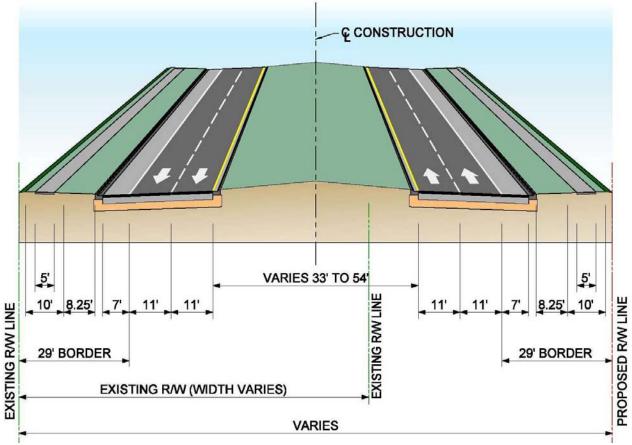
PROPOSED TYPICAL SECTION (PROPOSED SR 56 TO CHANCEY ROAD)
